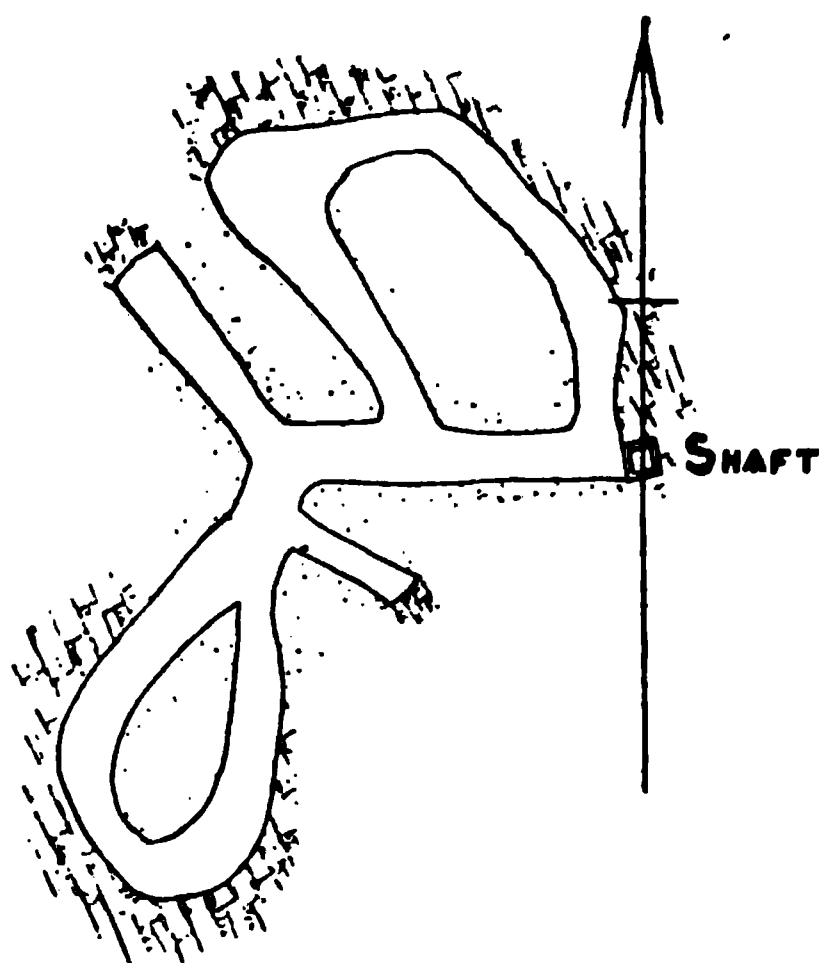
PLAN OF WORKINGS IN A FURNACE MINE. (Scale 60 Feet to an Inch.)
